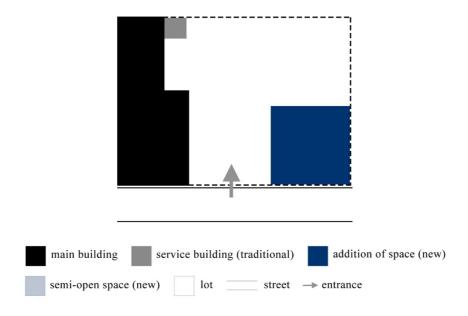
Case #4 House - Organization of the Buildings on the Lot
